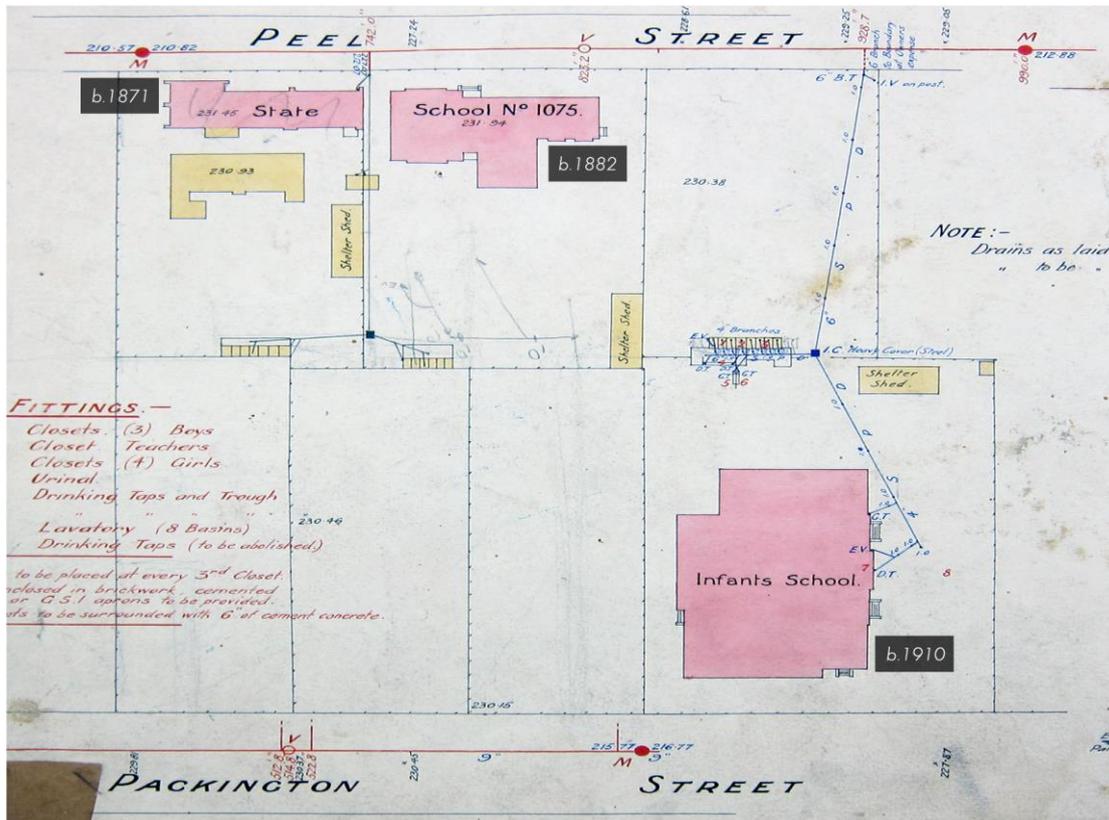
Site plan drawn in 1909 for the construction of Infants School. It shows the footprints of the two early brick buildings (in pink) along Peel Street. The built dates have been added. (Source: PROV)
